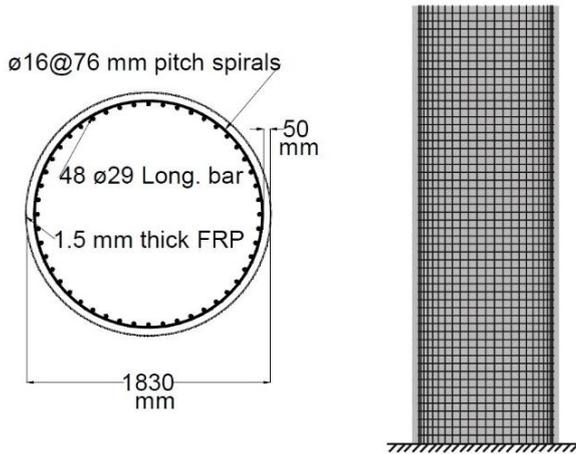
Cross section and elevation of FRP wrapped concrete bridge pier.
